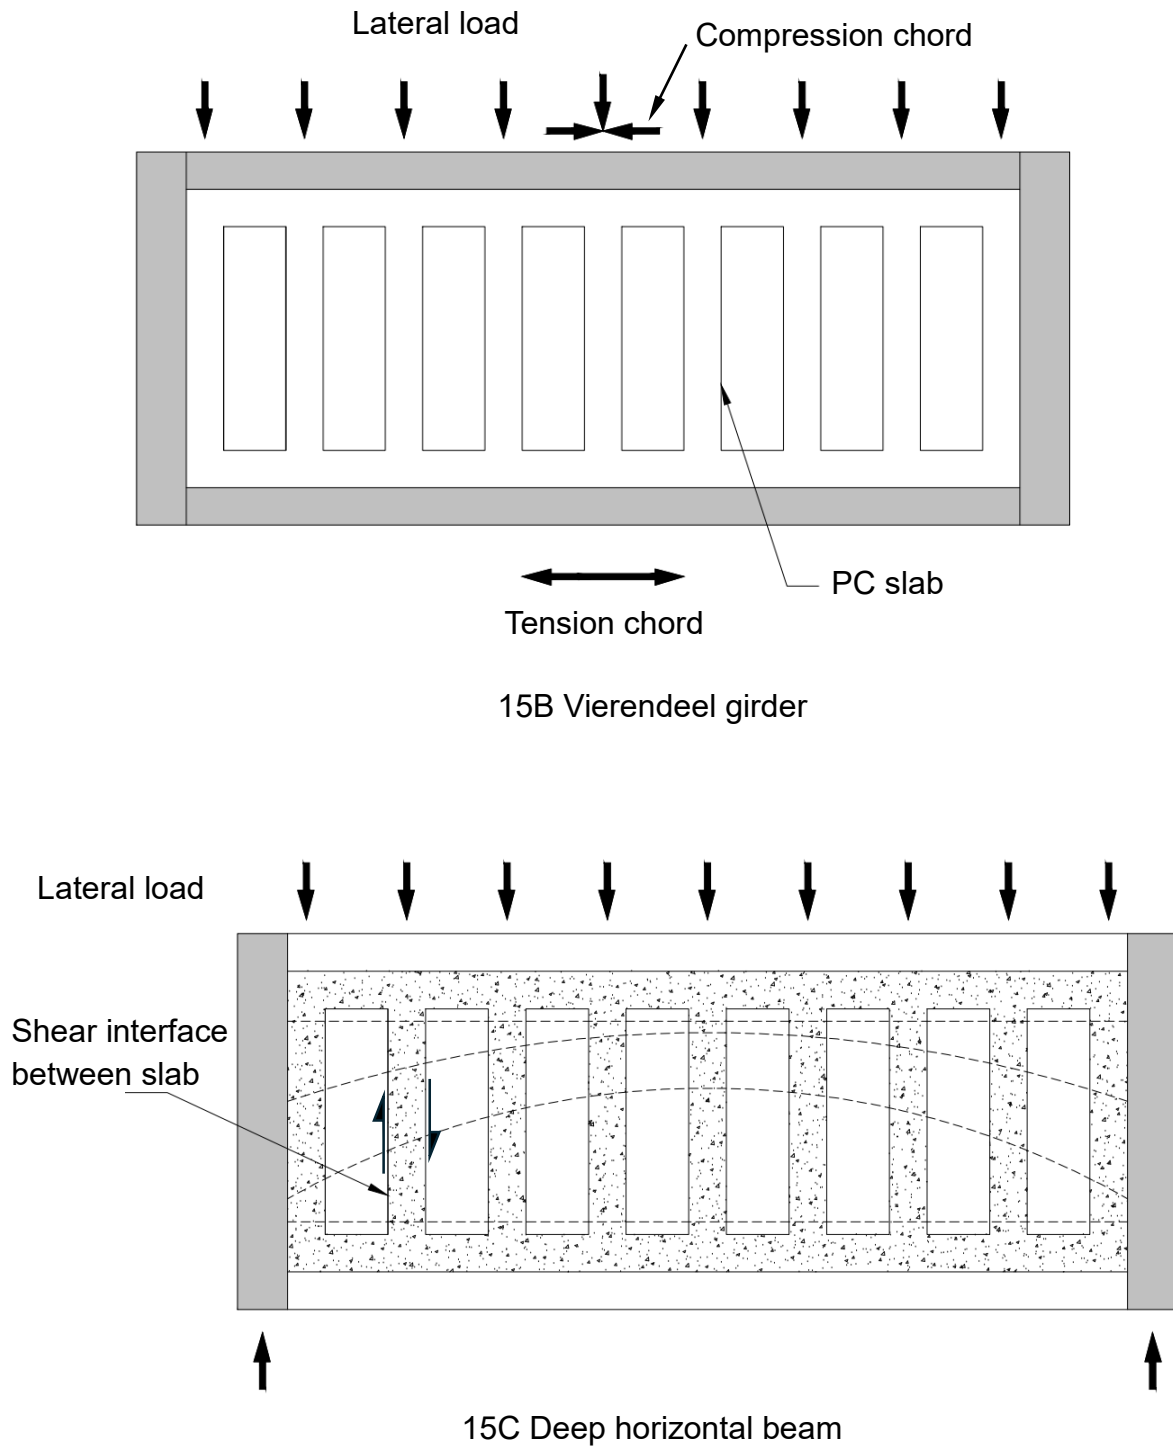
STRUCTURAL MODELS FOR FLOOR DIAPHRAGMS
